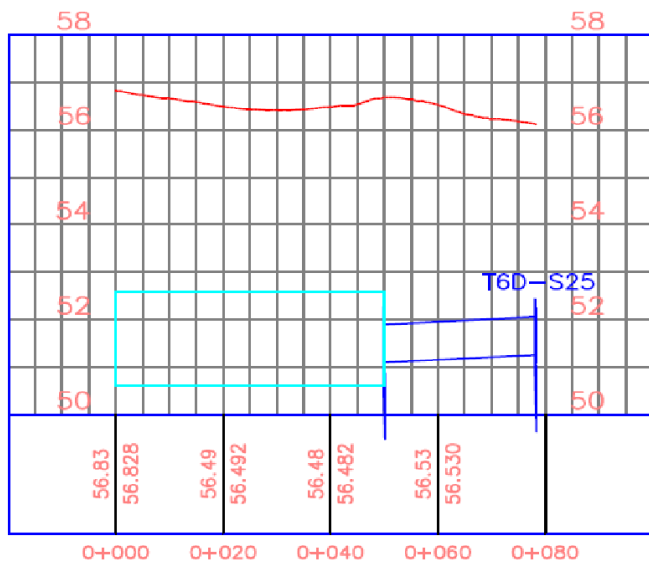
Elevation profile of existing ground, detention tank, and 300 mm diameter storm main
